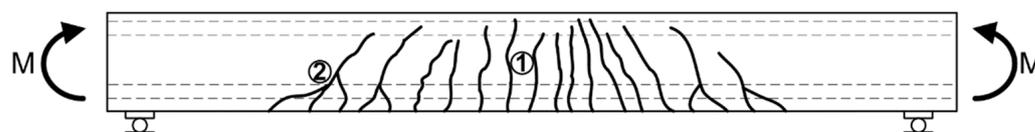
Macrocracks due to bending; 1—single cracks, 2—collective cracks, M —bending moment.
